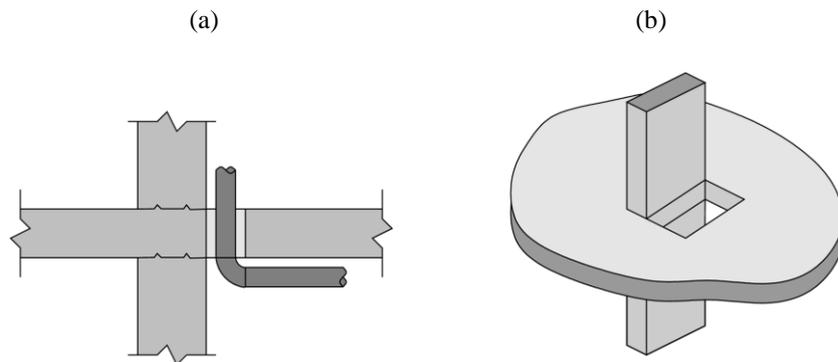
Slab with an opening adjacent to a column: (a) section at the opening, and (b) view of the slab-column connection
